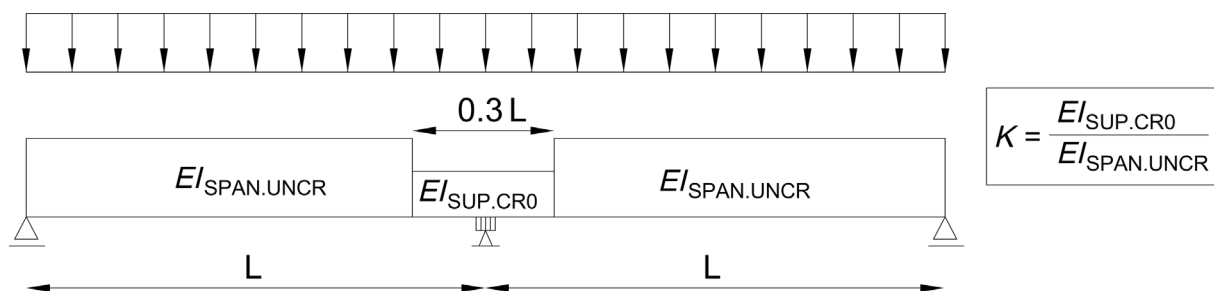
Definition of simplified stiffness distribution of precast prestressed beam made continuous at the load stage where hogging moment at support exceeds the negative cracking moment.
